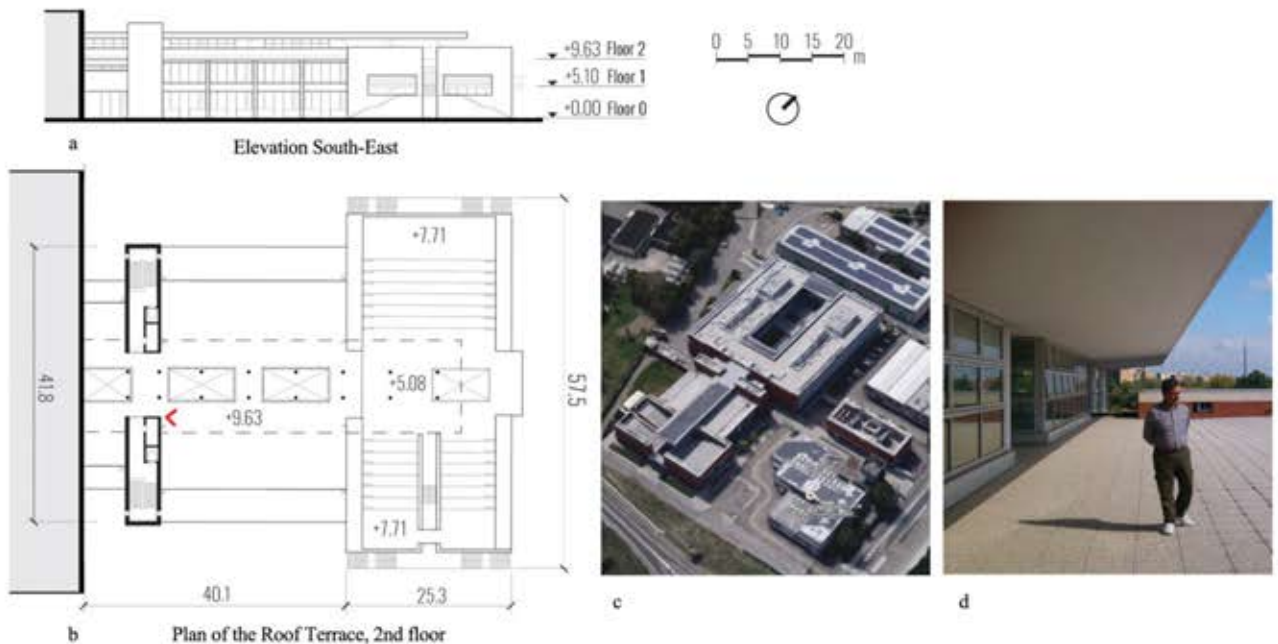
Existing building. a: Elevation of South-East facing façade. b: Roof terrace plan. c: View of the existing building and surrounding University facilities. d: View of the roof terrace where the pavilion is located, point of view is referenced in the plan by means of a red symbol.
